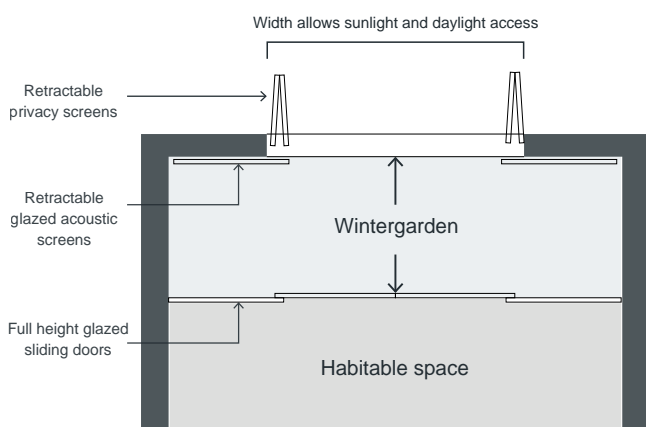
J.5 Balconies designed as acoustically sealed wintergardens can improve liveability of the balcony and adjoining habitable rooms. In considering how much of the facade is solid or open, the width of the openings needs to be sufficient to allow sunlight and daylight access
